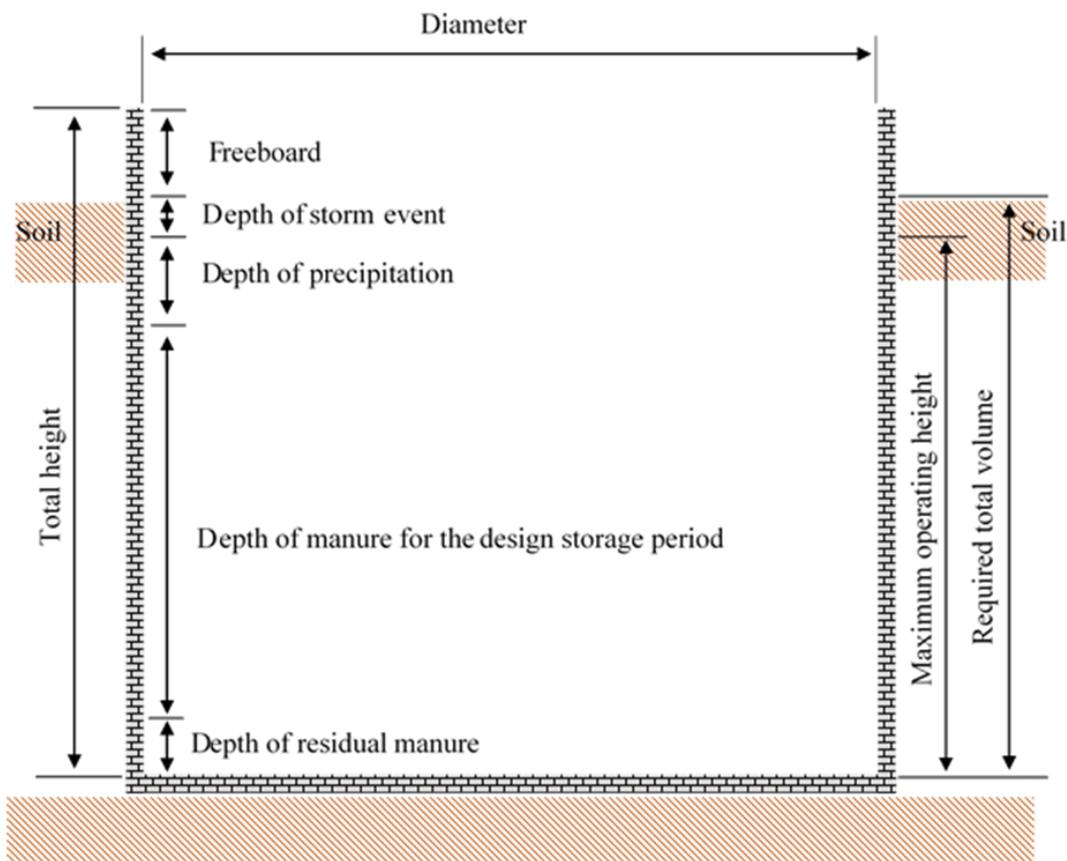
Cross section of a circular below ground liquid manure storage structure
